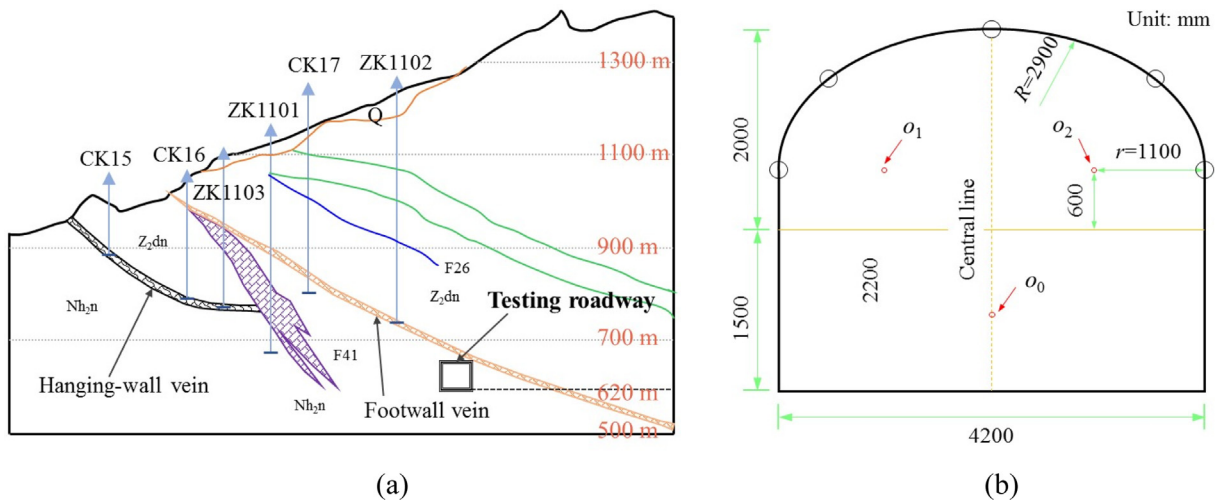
Configuration of the testing roadway. (a) Drawing exploration section, and (b) geometry of test roadway.
